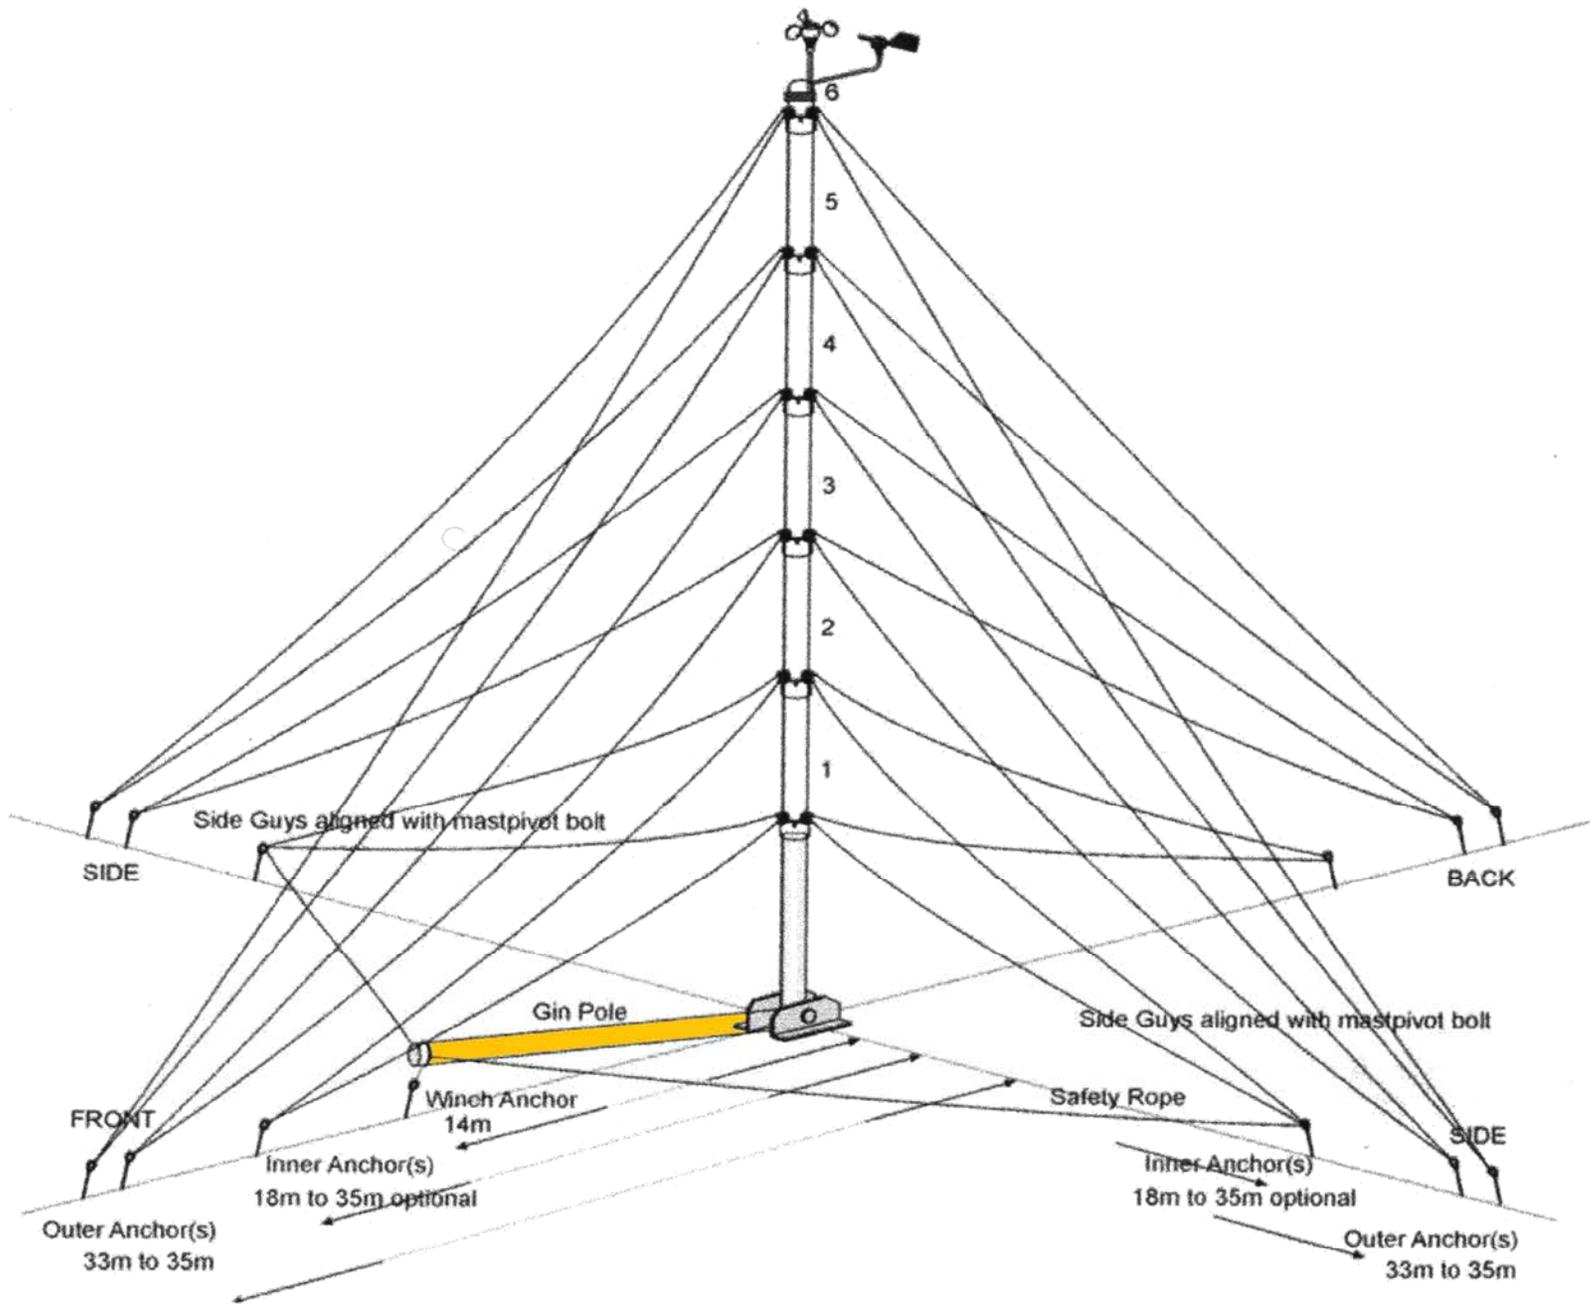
Guy line layout for a 50-meter met tower from Second Wind, Inc.
